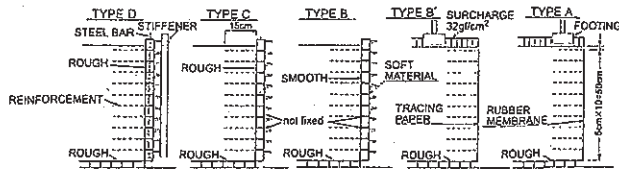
Small models of retaining walls having different types of facing used for laboratory tests
